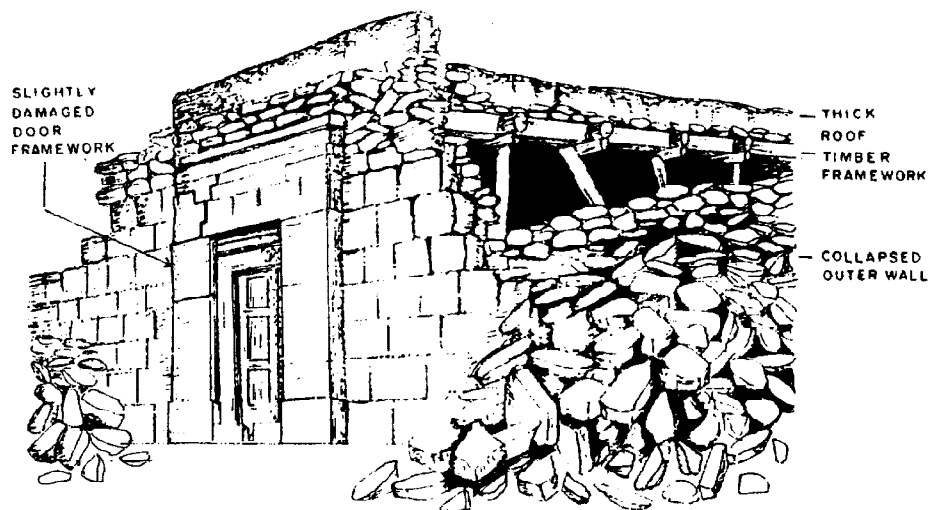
Damage to a conventional house in the meizoseist. Provision of timber columns and beams has prevented total collapse of the structure.
